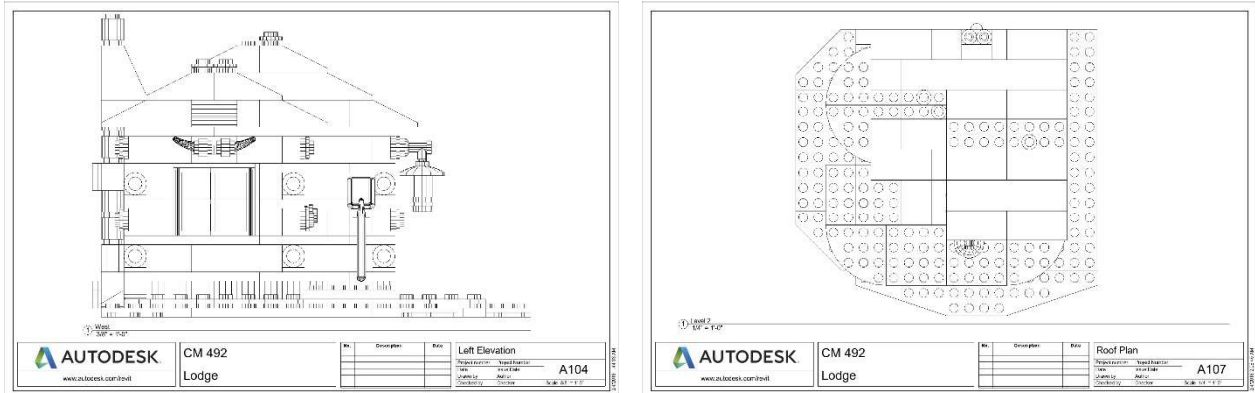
Left Elevation and Roof Plan of the Lakeside Lodge from Revit
